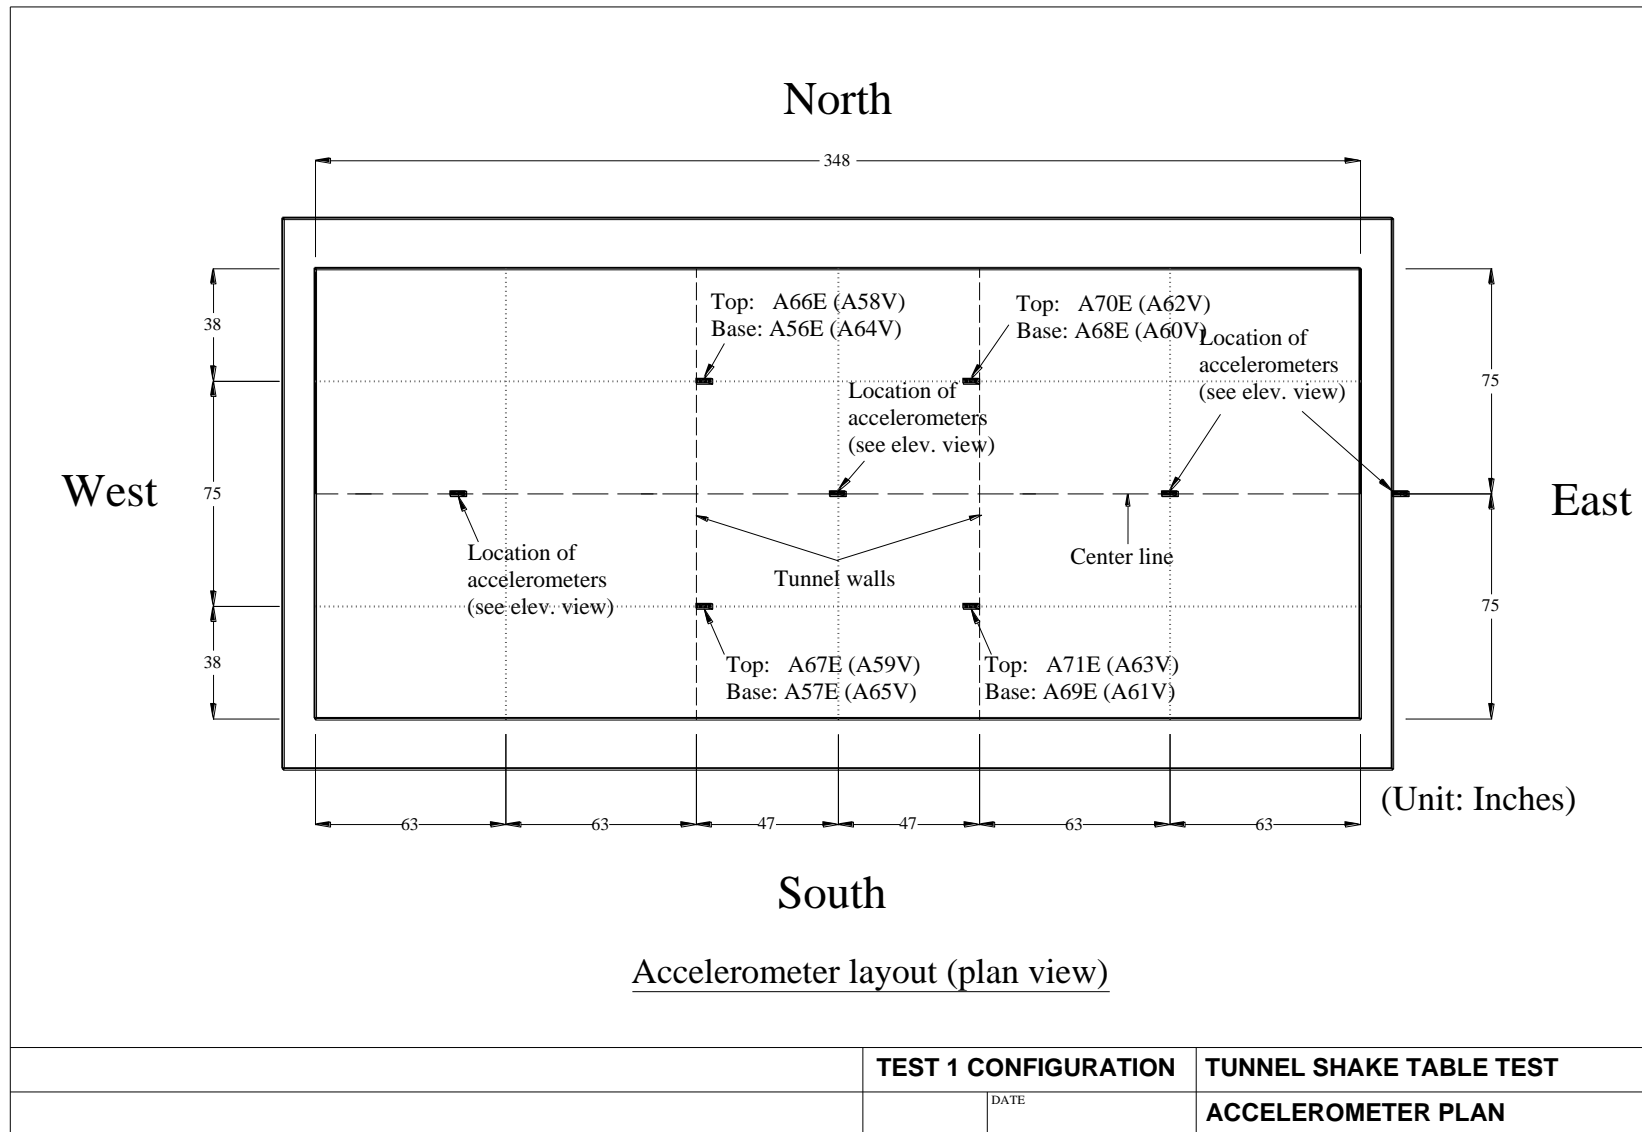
Plan view of accelerometer (A) instrumentation layout
